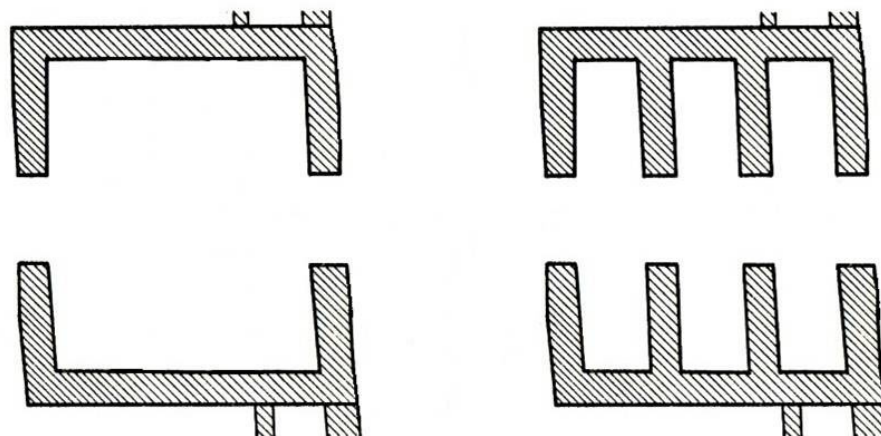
Left: The architectural goal: a large gatehouse building with a central passage. Right: The piers as a practical solution for shortening the length of required roofing beams.¹
